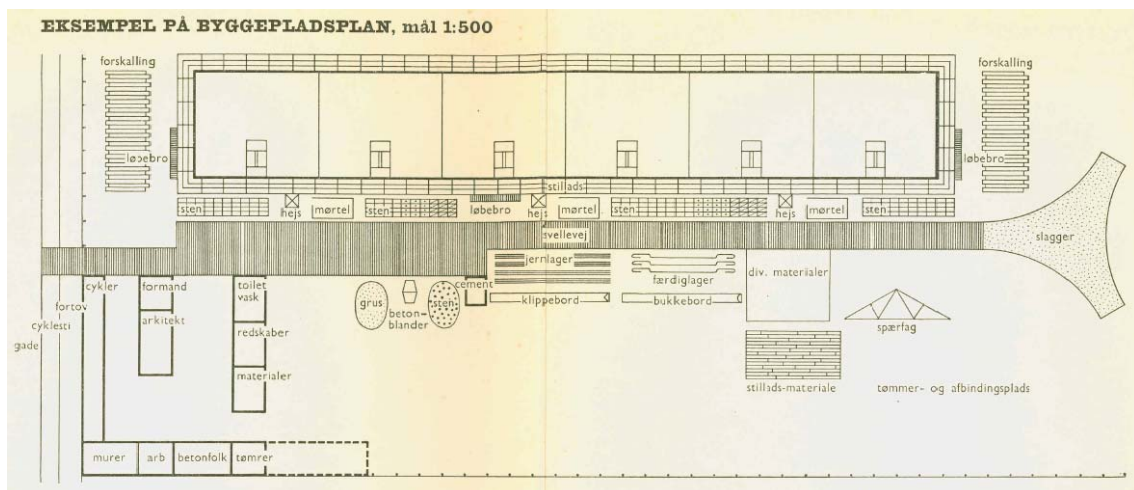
Example of a building site plan (S.B.I., 1956: 29).
